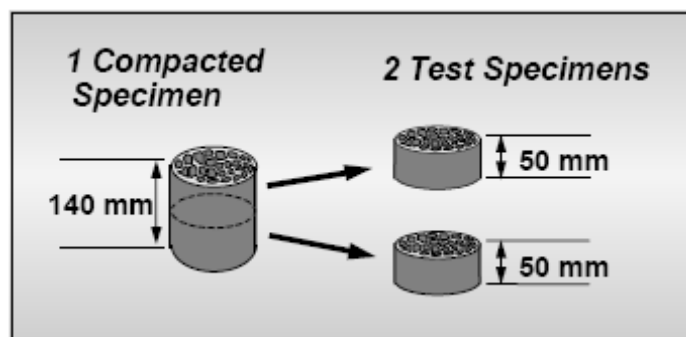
Cutting compacted specimen at required dimensions for testing (FHWA Superpave, 1995).
